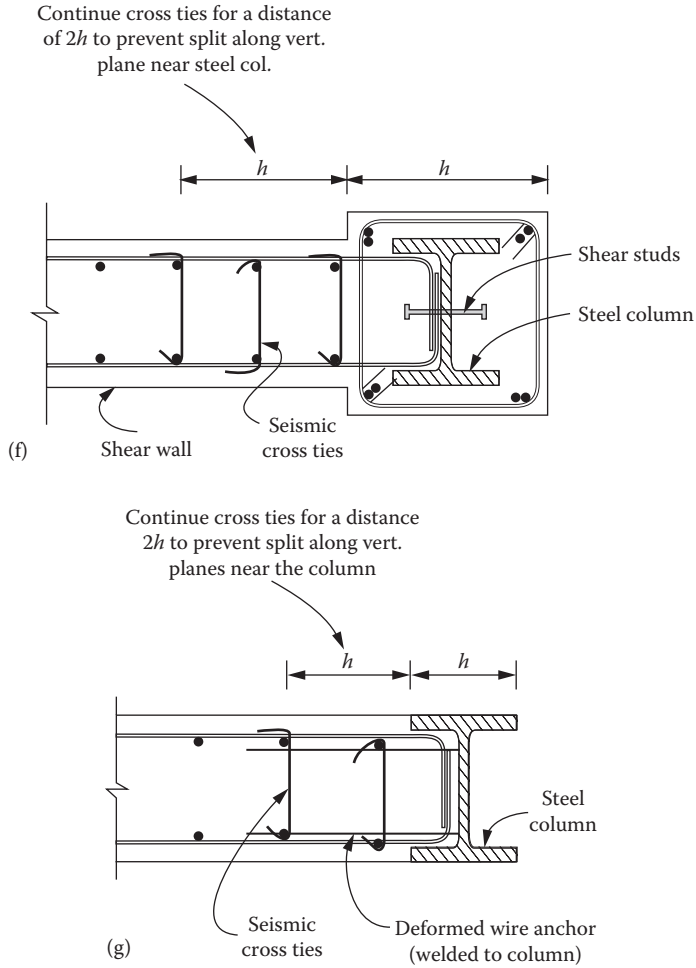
(Continued) Composite steel plate shear walls: (f) concrete wall with steel boundary elements; (g) concrete wall with steel boundary elements.
